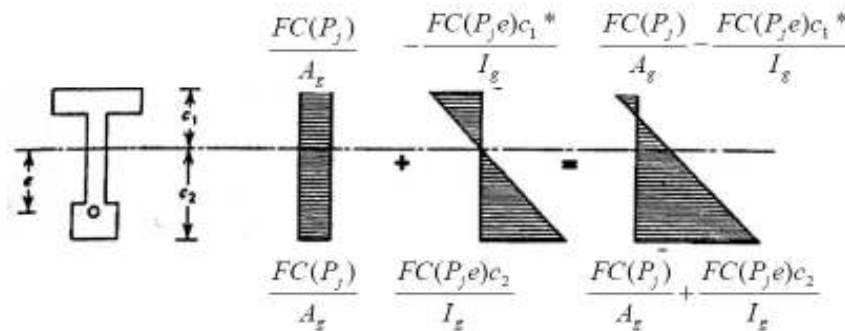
Elastic Stresses in an Uncracked Prestress Beam.
